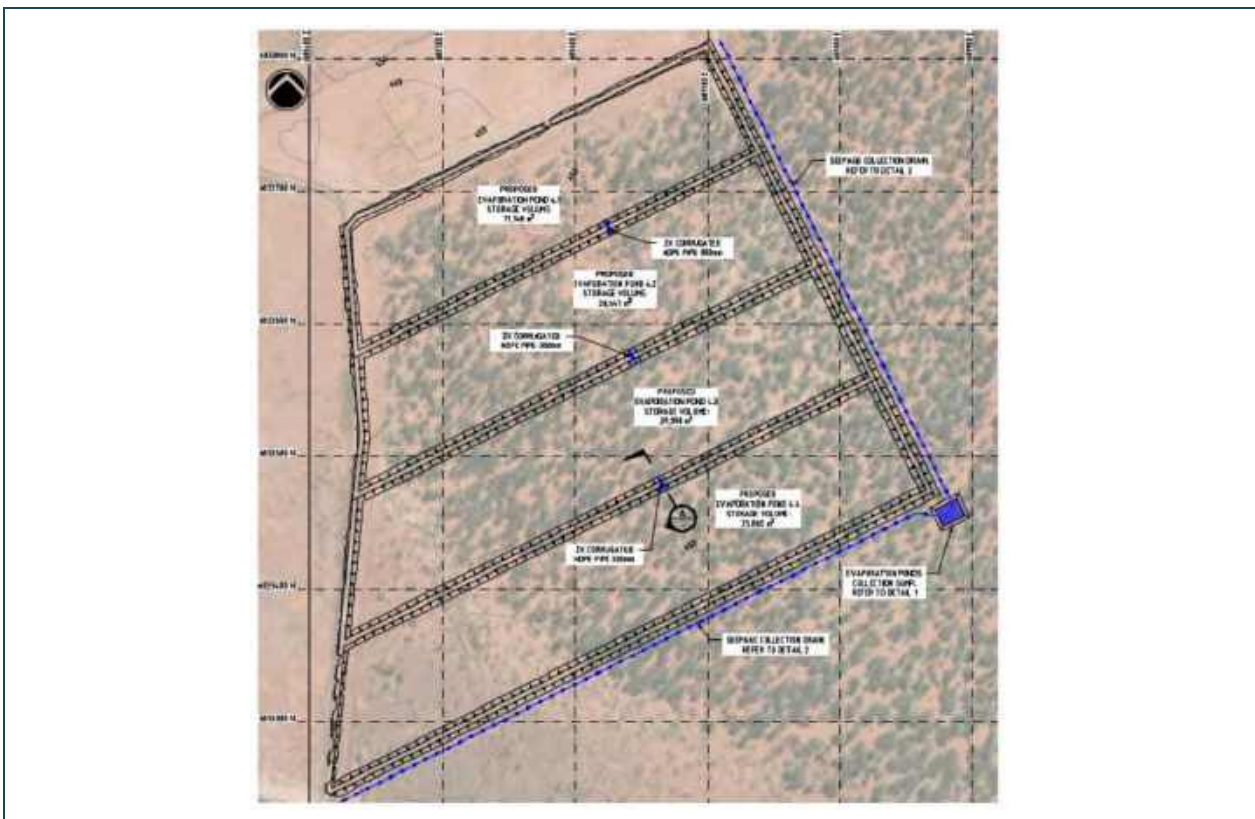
Proposed Evaporation Pond Expansion Design (TailCon, 2025)
